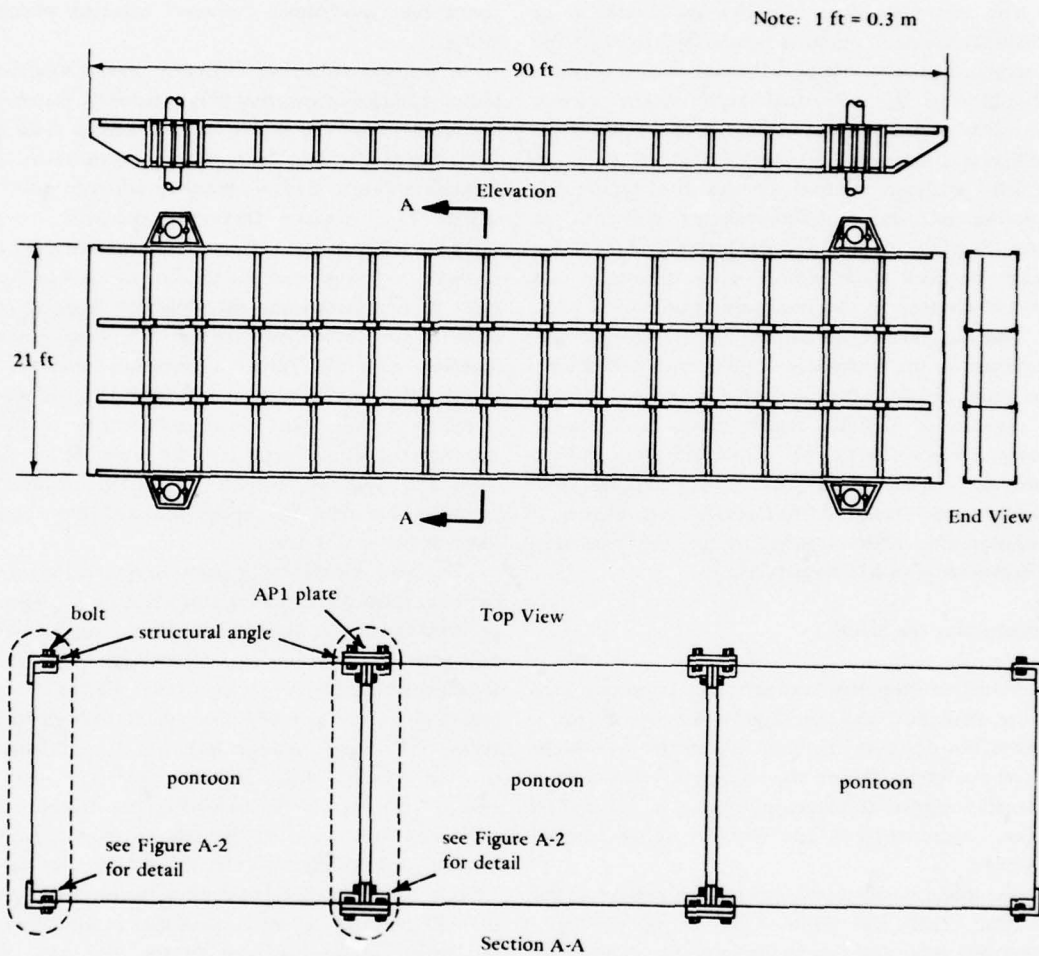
Schematic of 3x15 pontoon causeway structure.
